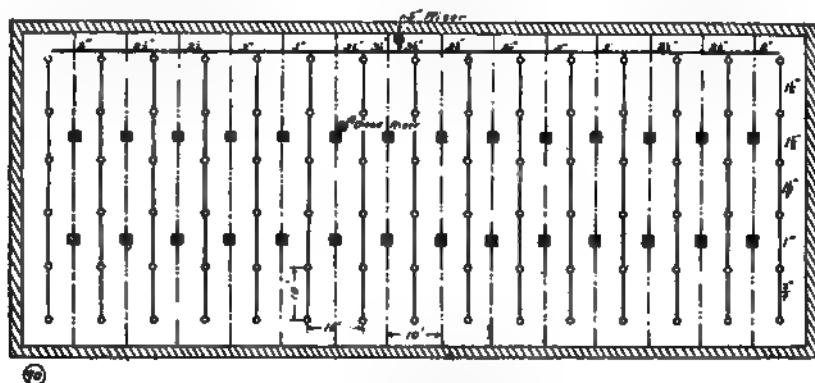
SPACING OF SPRINKLER HEADS UNDER MILL CONSTRUCTION CEILING. (SPRINKLERS SPACED 10 FEET APART ON A LINE IN 10-FOOT BAYS.)
